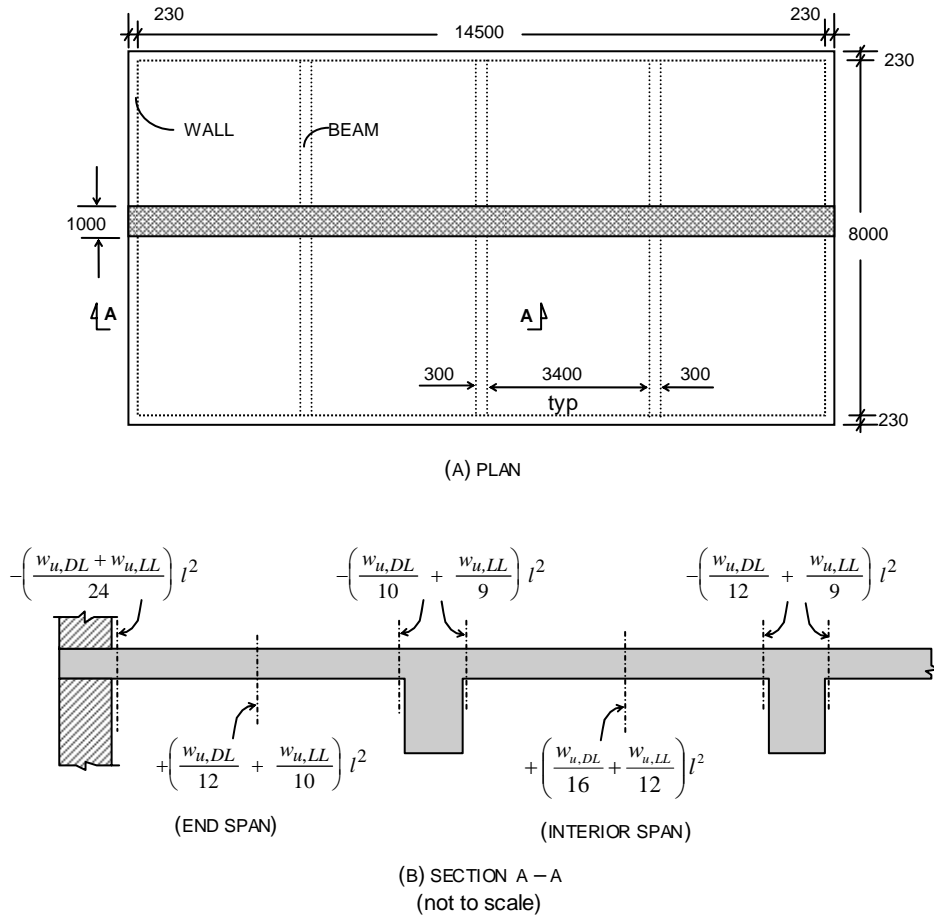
A continuous one-way slab floor system — Example 5.3
